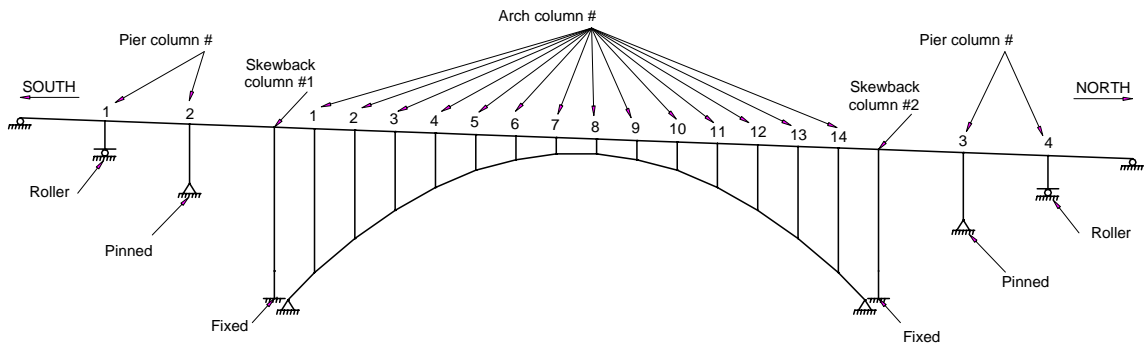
BEAM-COLUMN rating model of pier, skewback, and arch columns.
